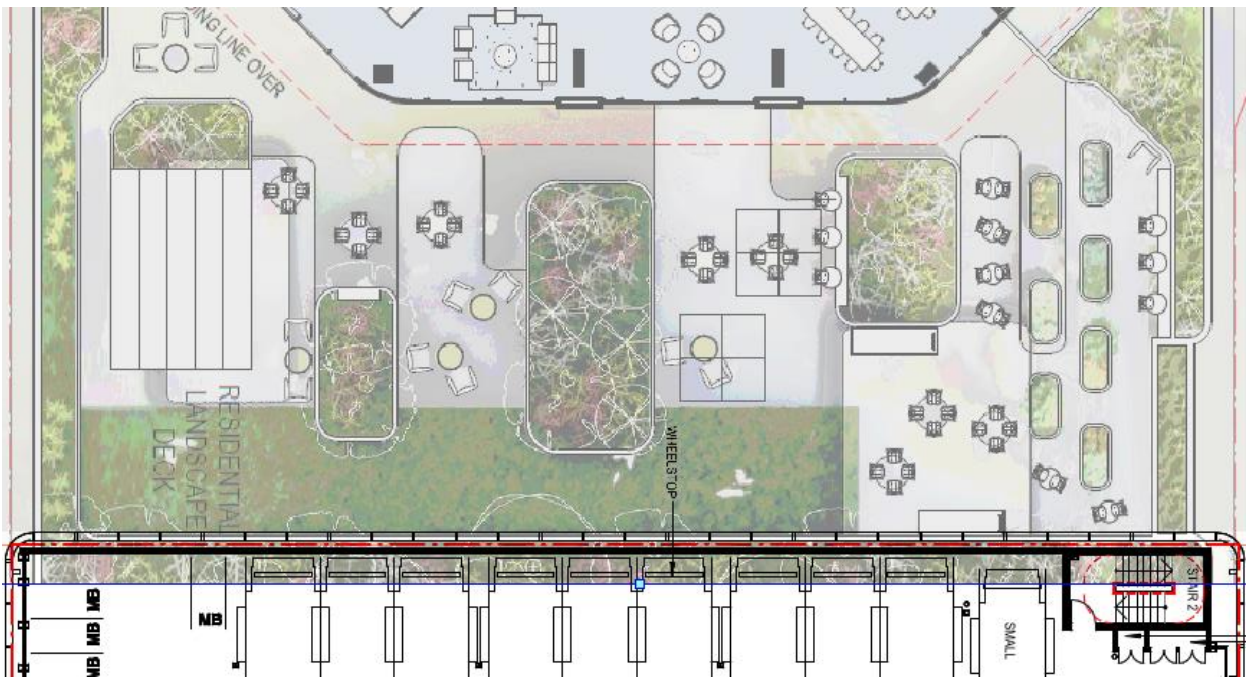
Boundary Wall Impact on Adjoining Landscape Deck Area
